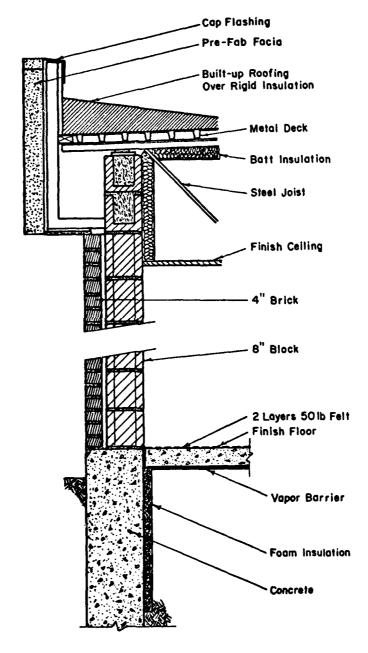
Wall, floor, and ceiling detail -- battalion headquarters and classroom.
